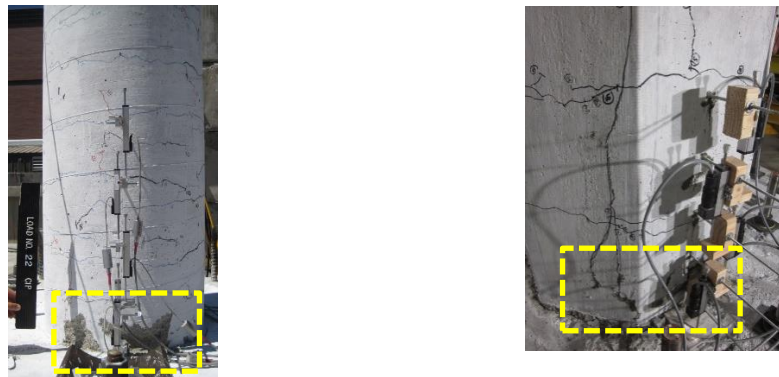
4 Samples of RC Bridge Column Condition at DS-3 [45], [46]
